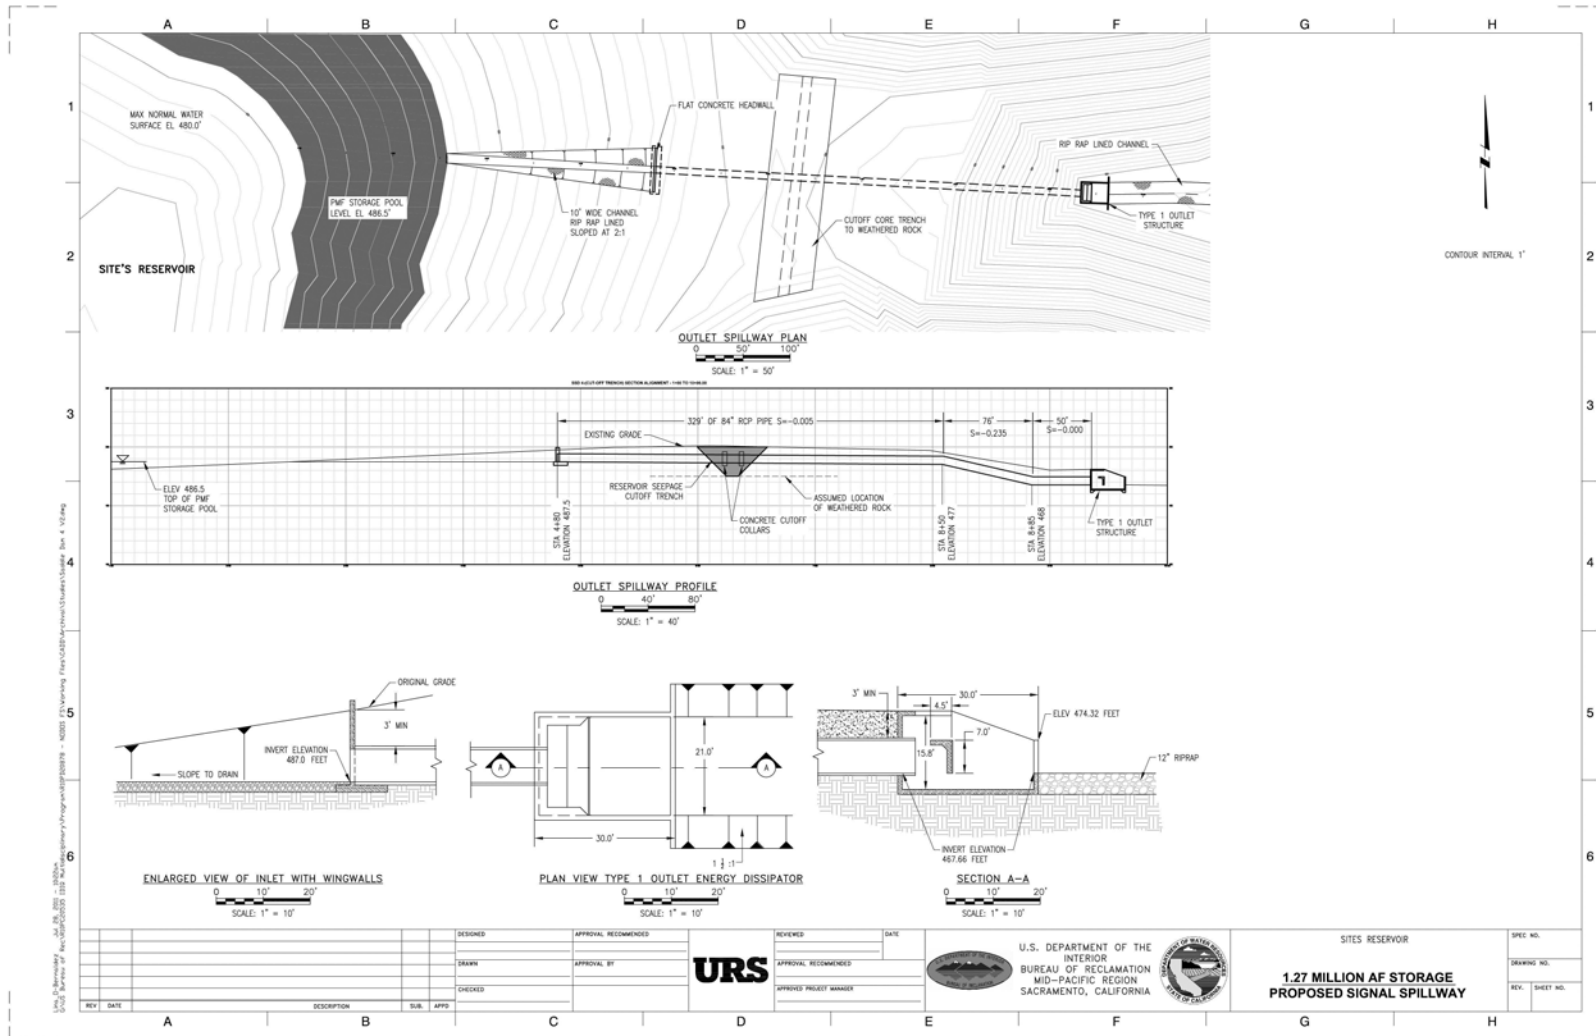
Signal Spillway – Saddle Dam 6 – 1.3 MAF Reservoir – Plan, Elevation, Sections
